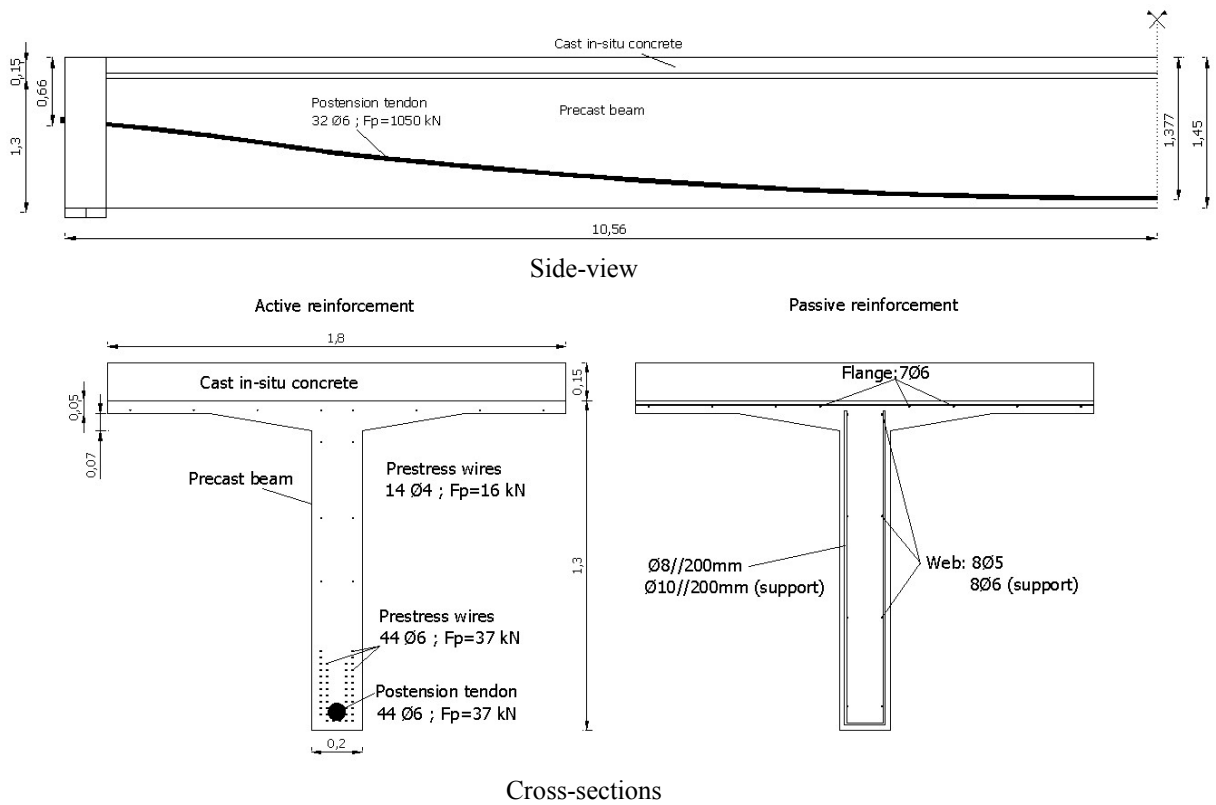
Geometry and reinforcement of the beams of the Wassnerwald bridge
